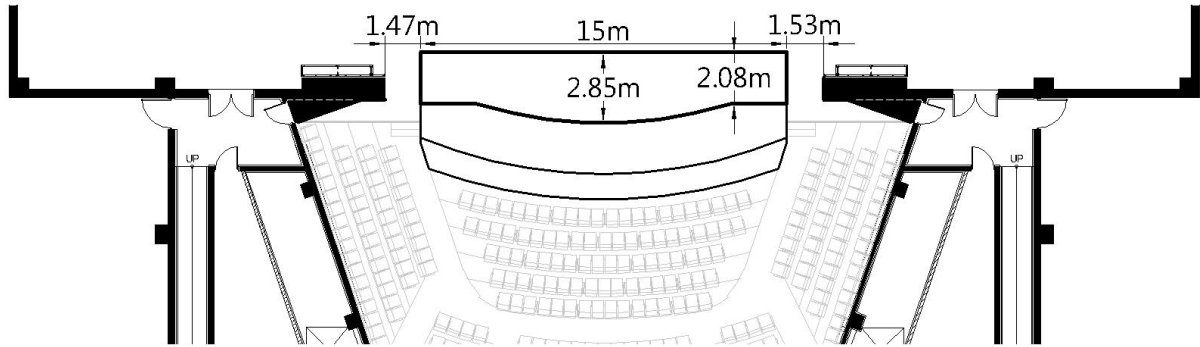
Orchestra Pit Elevation Platform location plan
